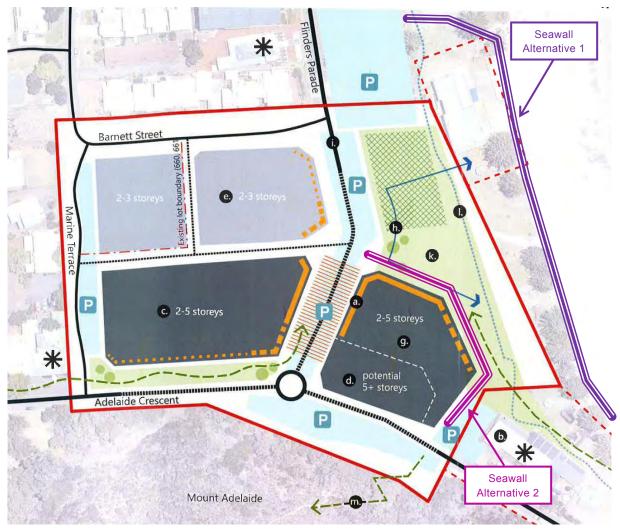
Concept Layouts for both Seawall Layout Alternatives
